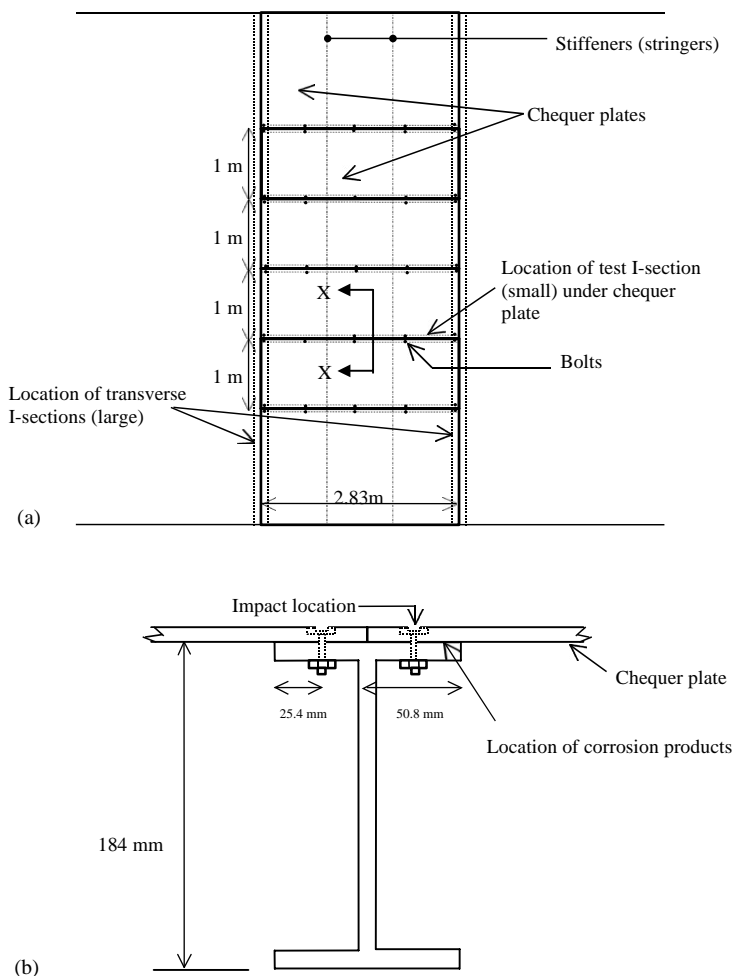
Detail of chequer plate flooring structural system. (a) Plan of third floor; (b) Section X-X.
